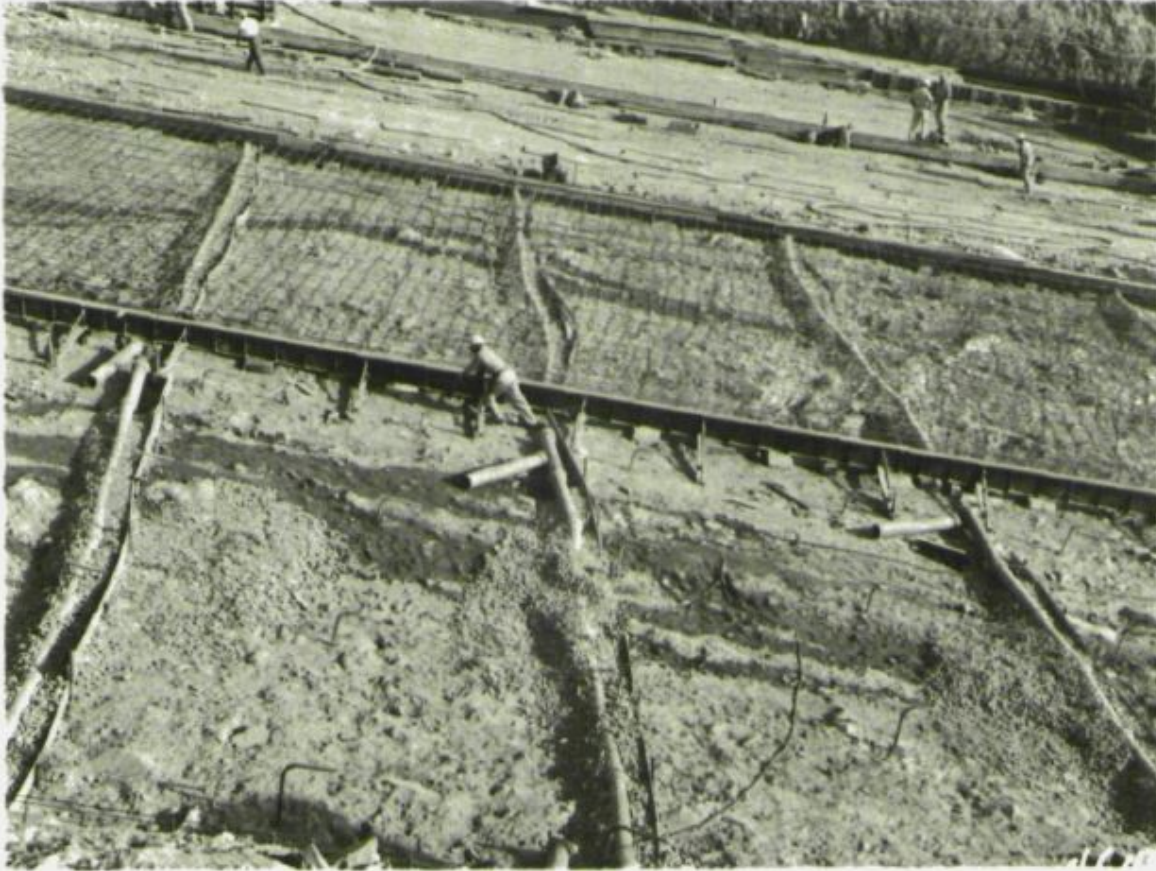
Chute foundation in vicinity of Sta. 33+60. Tile and gravel underdrains in lanes 2 and 3, rebar in lane 3. View southeast.
